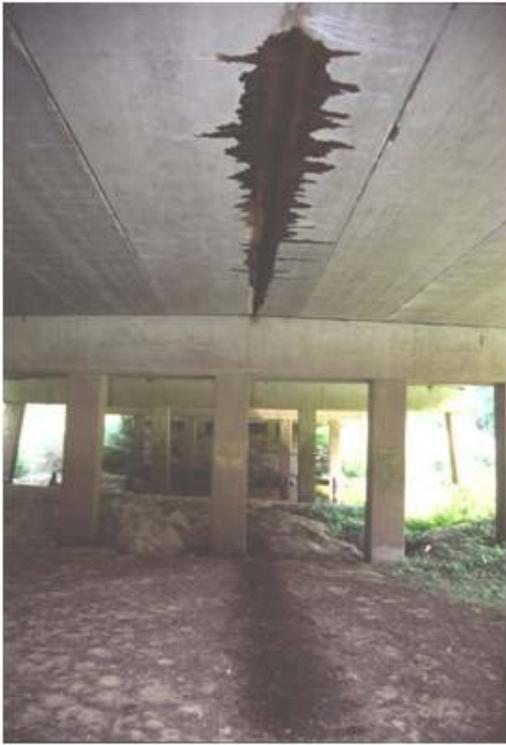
Staining along longitudinal joint. Note guano deposits on the ground. Photo 8: Staining on underside of expansion joint from bat use.
